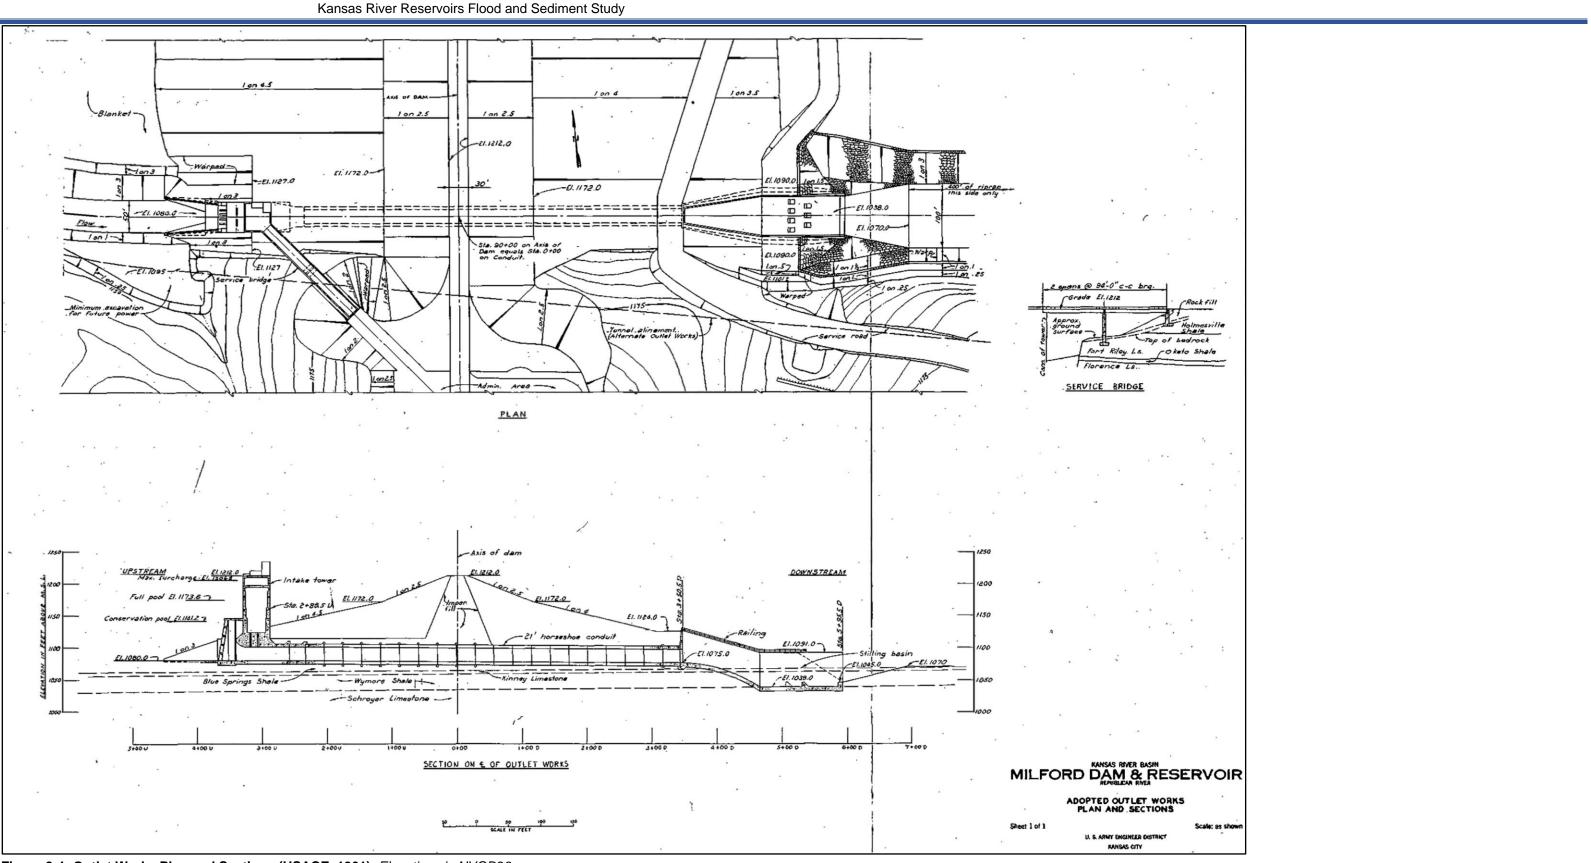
Outlet Works Plan and Sections (USACE, 1961). Elevations in NVGD29.
